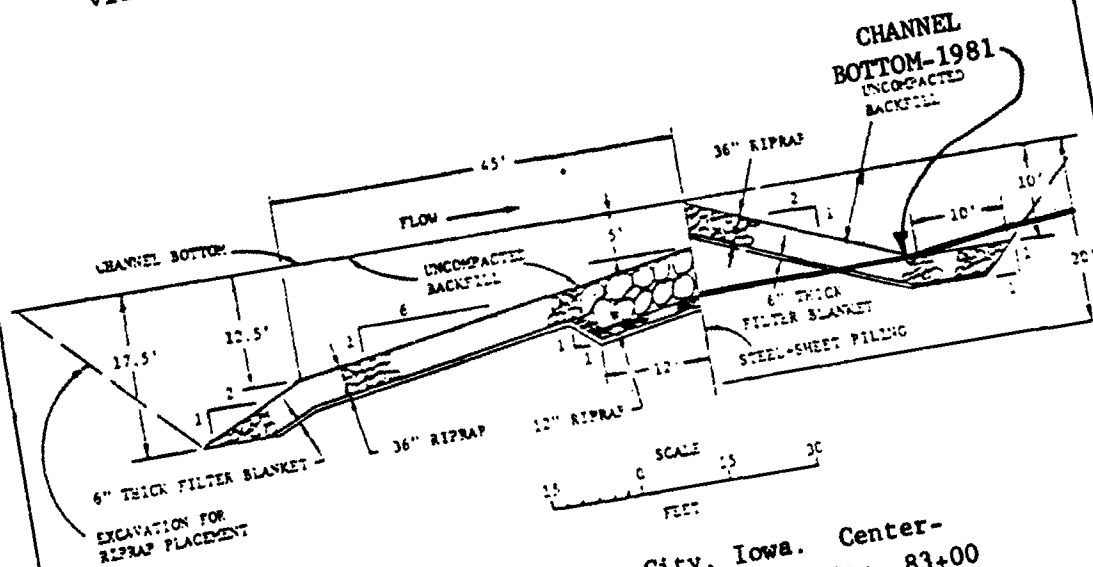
Floyd River at Sioux City, Iowa. Center-line view of sheet piling and rock sill #5, Sta. 83+00 Results of April 1981 survey superimposed.
